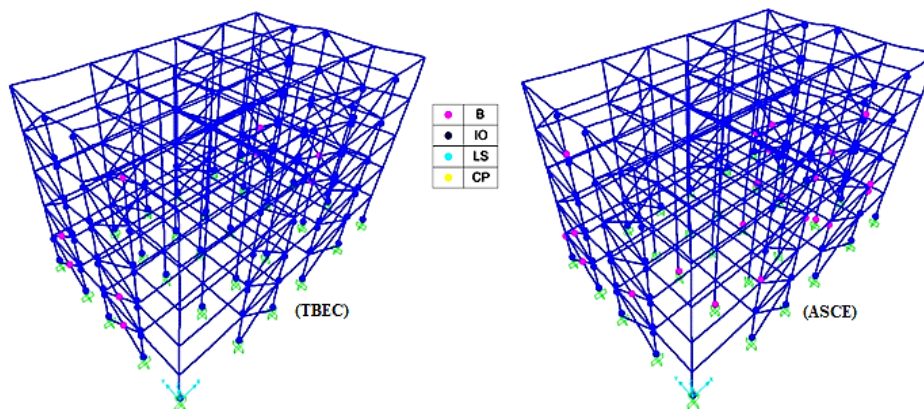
Plastic hinge distributions for the 5 storey existing building at y direction.
